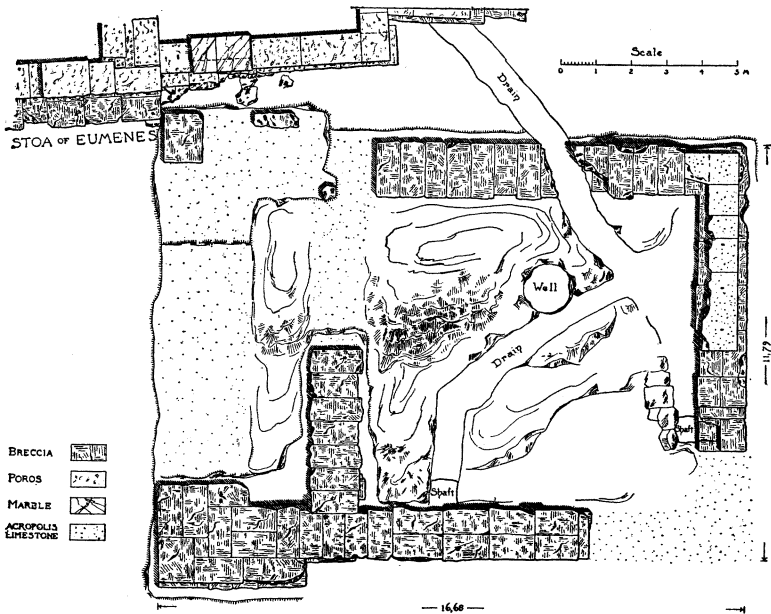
PLAN OF FOUNDATIONS, PRESENT STATE.
